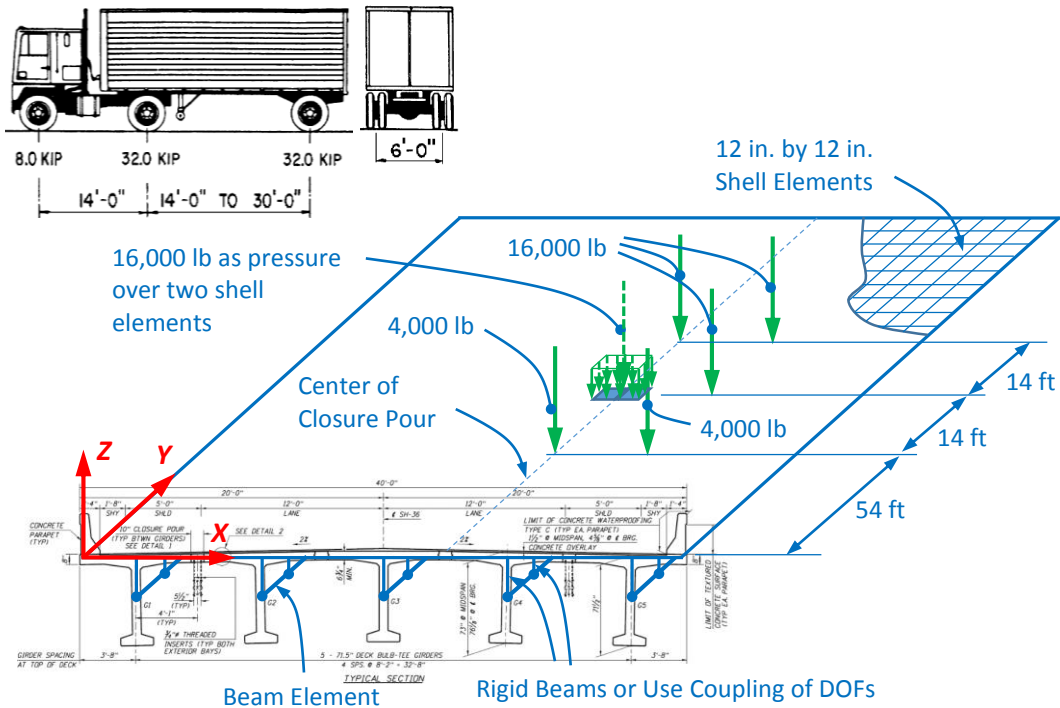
Section view of the bridge with AASHTO design truck in one lane (NTS).
